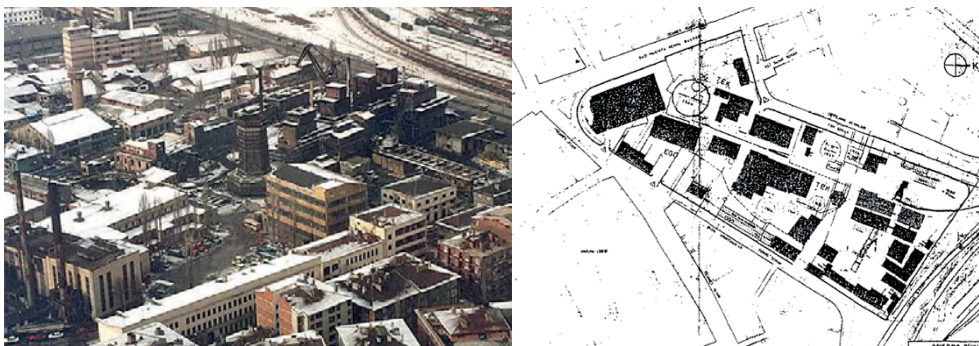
Electric and Gas Factory General View (Source: Goethe-Institut) and Site Plan (Source: Kıraç, 2001: 224).
